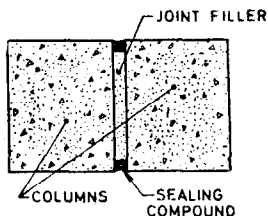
TYPICAL DETAILS OF EXPANSION JOINT AT PANEL WALLS OF RCC FRAMED STRUCTURE
